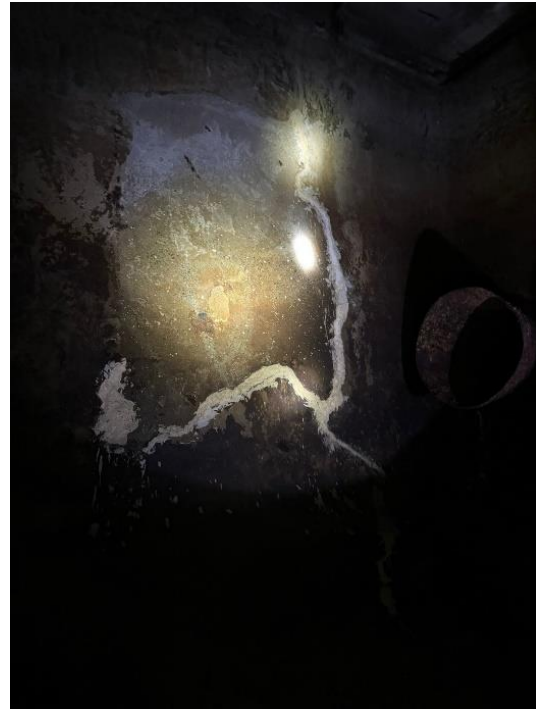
Cracks on the walls of water reservoir No. 2
